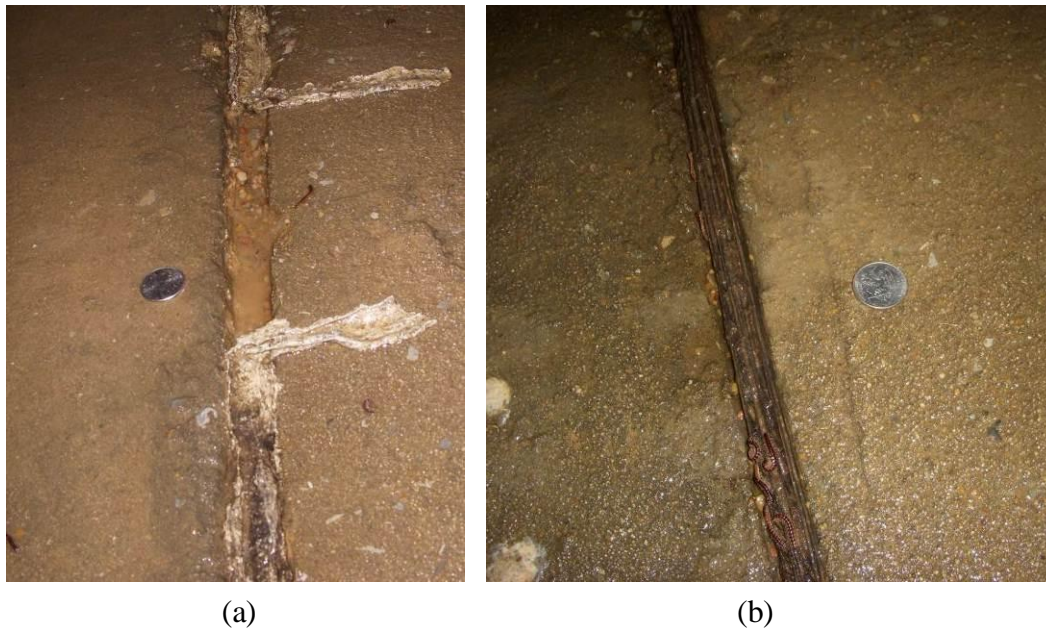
(a) Contraction Joint and Sealant in AEB Culvert at 257+69;
